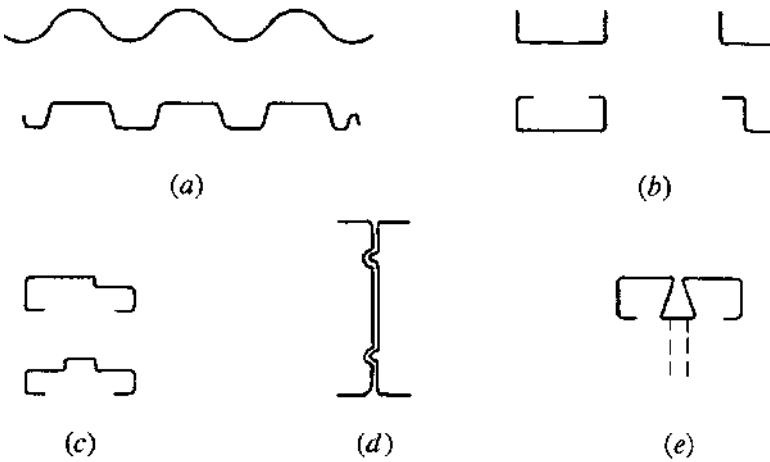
Cross-sectional shapes of common cold-formed products.
